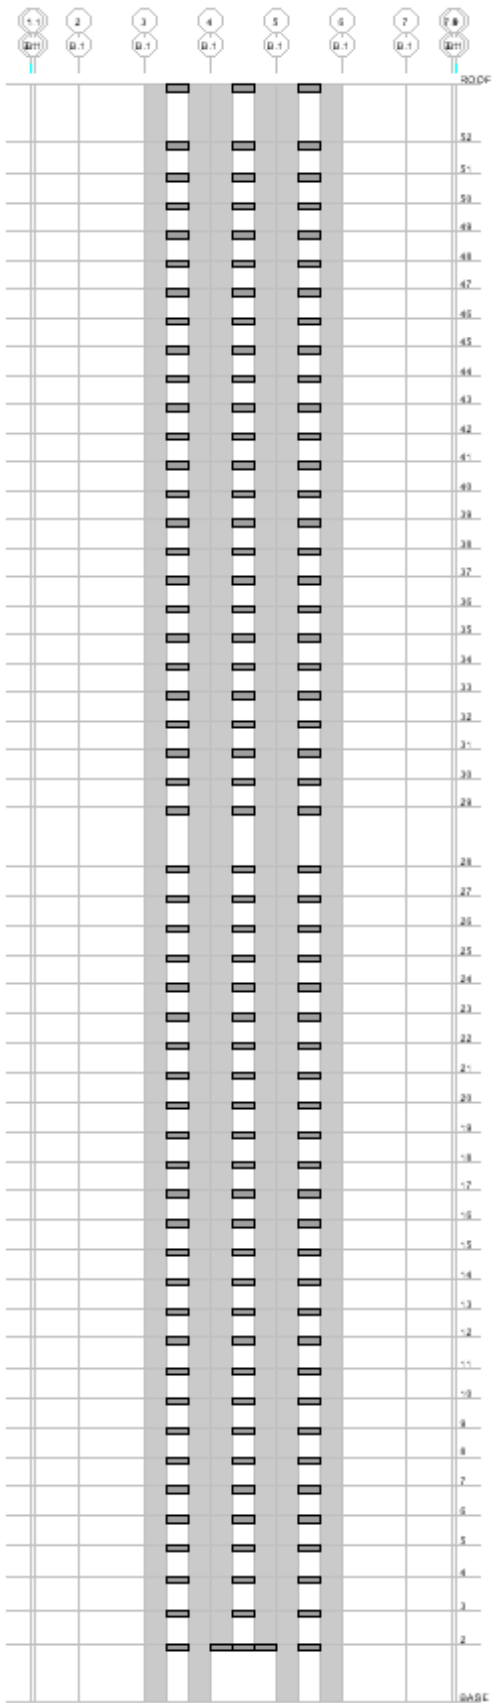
Building Elevation on Grid Lines B.1 and C.9
